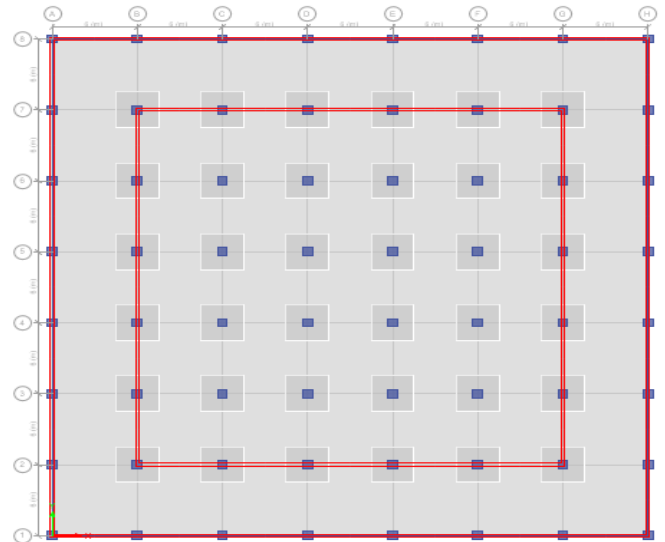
Plan of masonry infill with 50% infill in double outer core with perimeter beams in flat slab structure.
